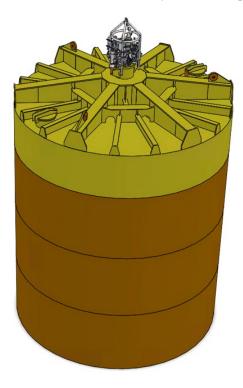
Indicative Drawing of a Suction Pump Mounted atop a Suction Bucket
